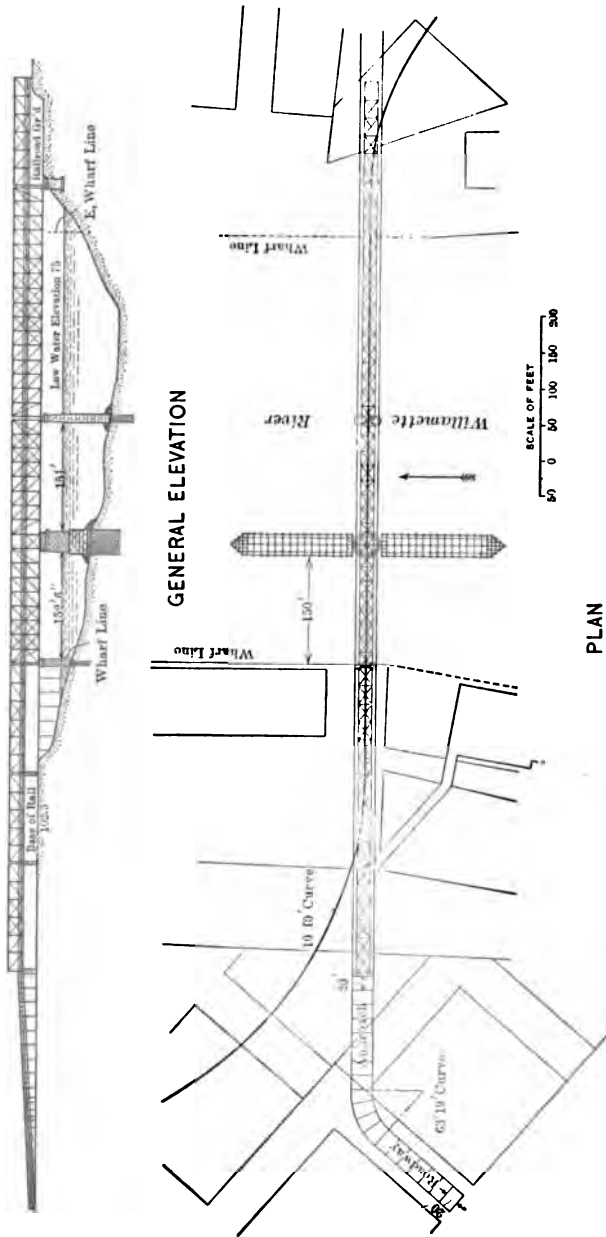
PROFILE OF STEEL BRIDGE PIERS, PORTLAND.
